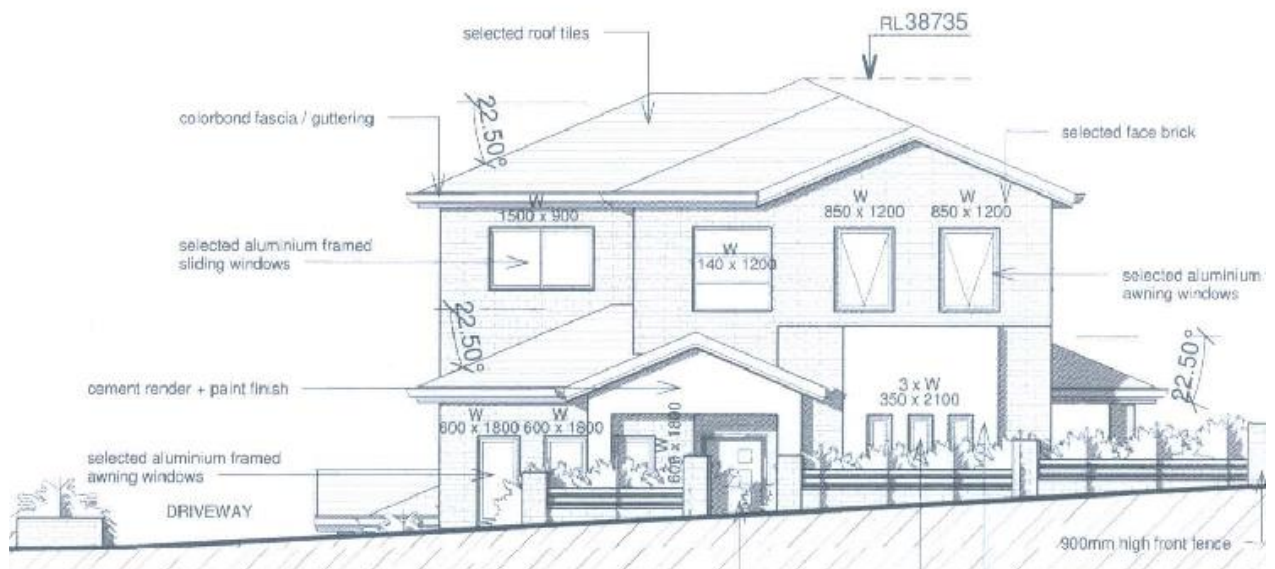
Front elevation of the proposed development from the Anthony Road frontage.
